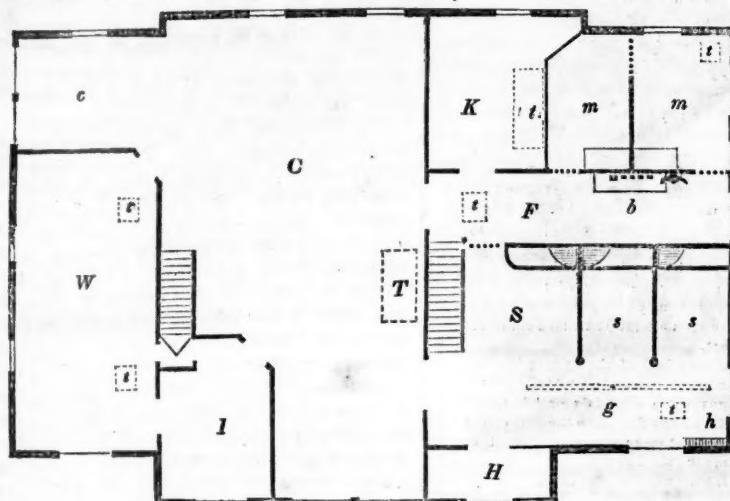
PLAN OF MAIN OR GROUND FLOOR.
